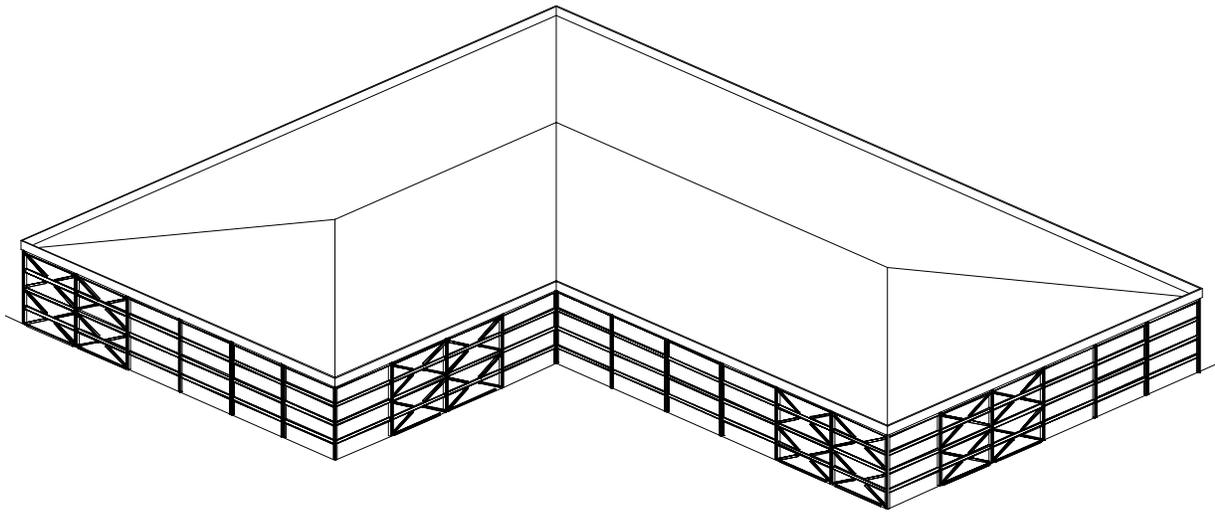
A-1. Four-story steel frame office building with special concentric braced frames (SCBF)
